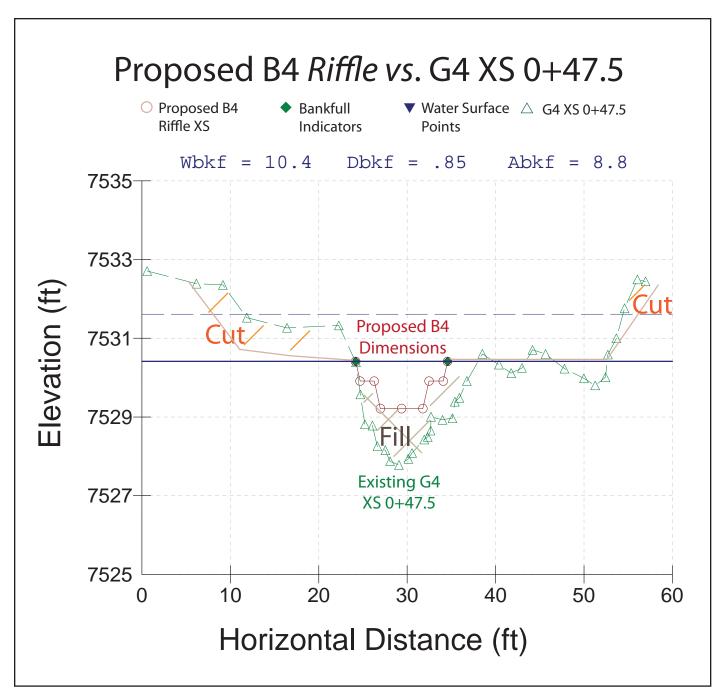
The proposed B4 *riffle* cross-section compared to the existing G4 cross-section 0+47.5, indicating the cut and fill requirements and new bankfull elevation.
